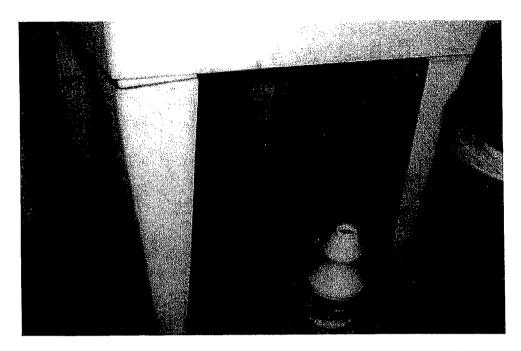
View looking at a floor drain in the interior of the subject property building.
